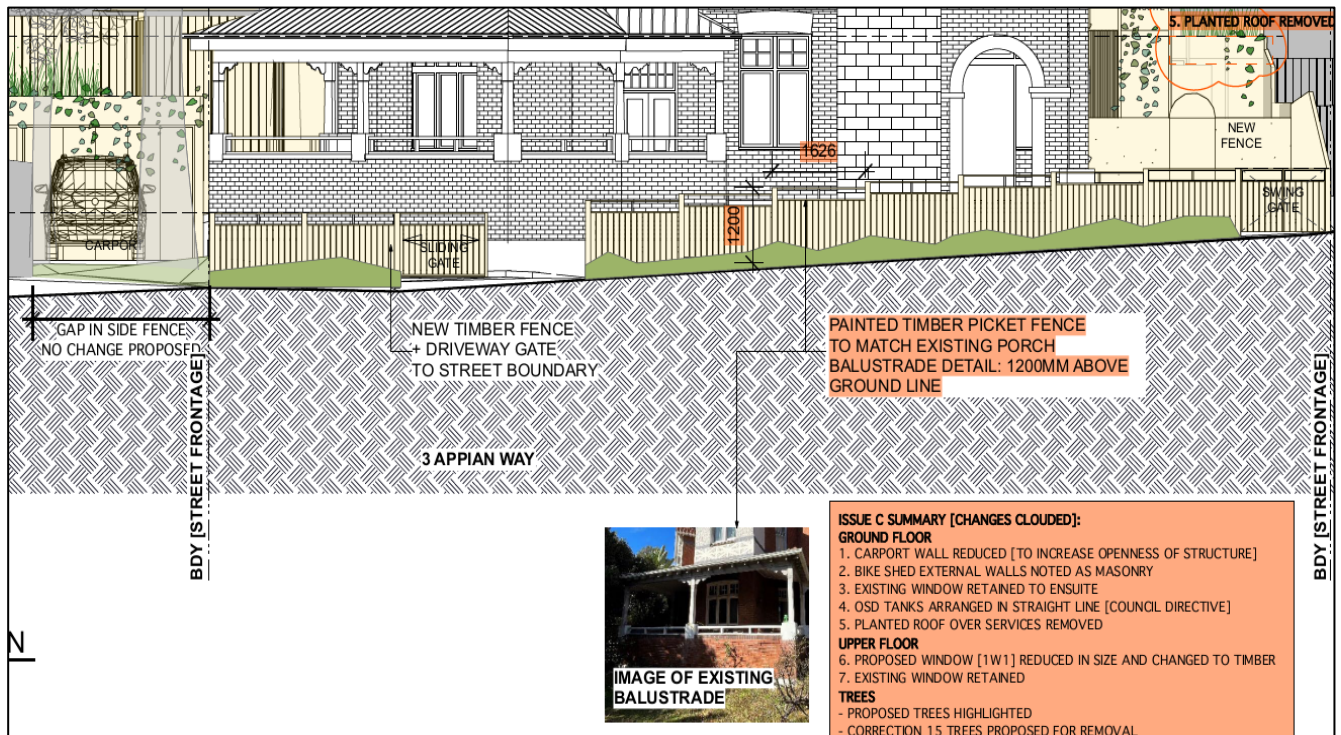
Extract of the applicant's submitted revised Street Elevation Plan detailing front fencing.
